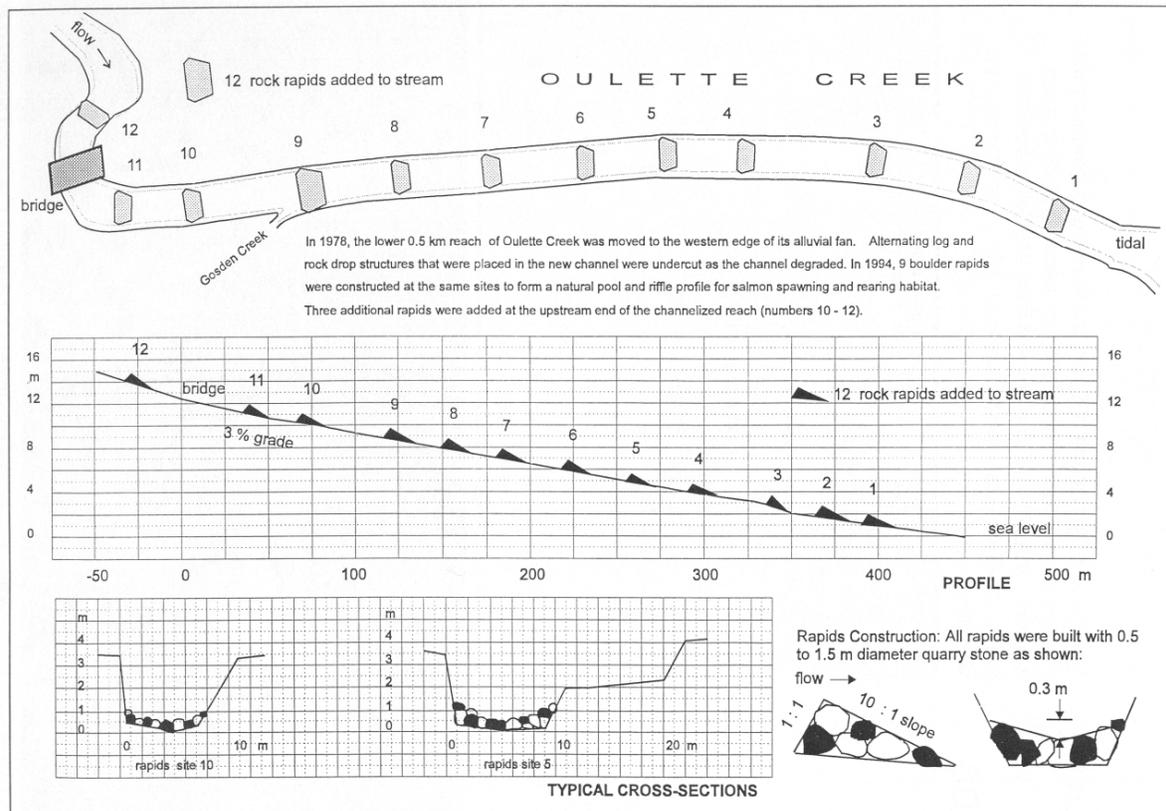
Pool and riffle plan constructed in the diverted reach of Oulette Creek BC.
